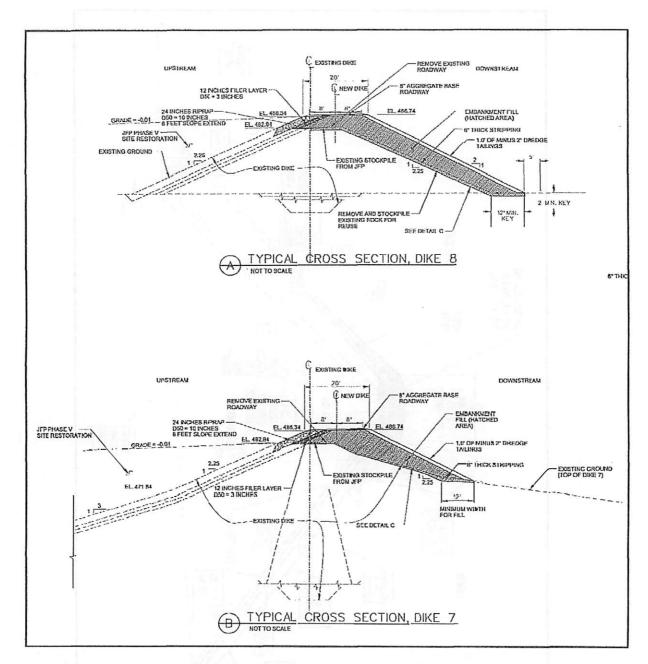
Preliminary typical cross sections for 3.5-foot raise of Dike 7and Dike 8.
